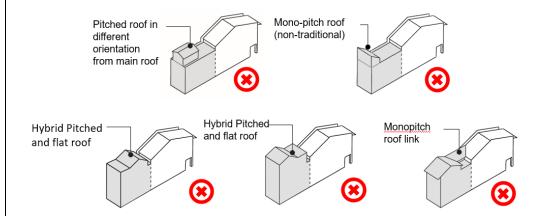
Non-traditional roof forms which will not be allowed.
